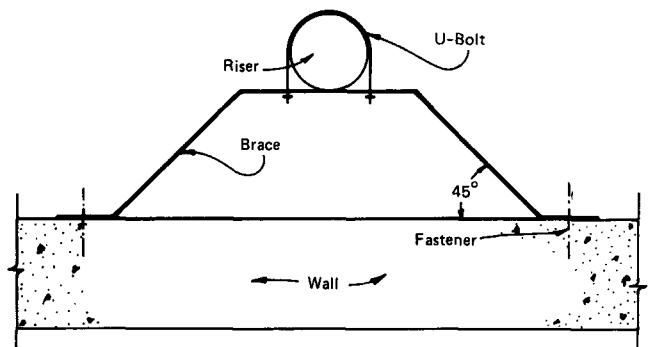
(e) Detail of four-way brace at riser.
